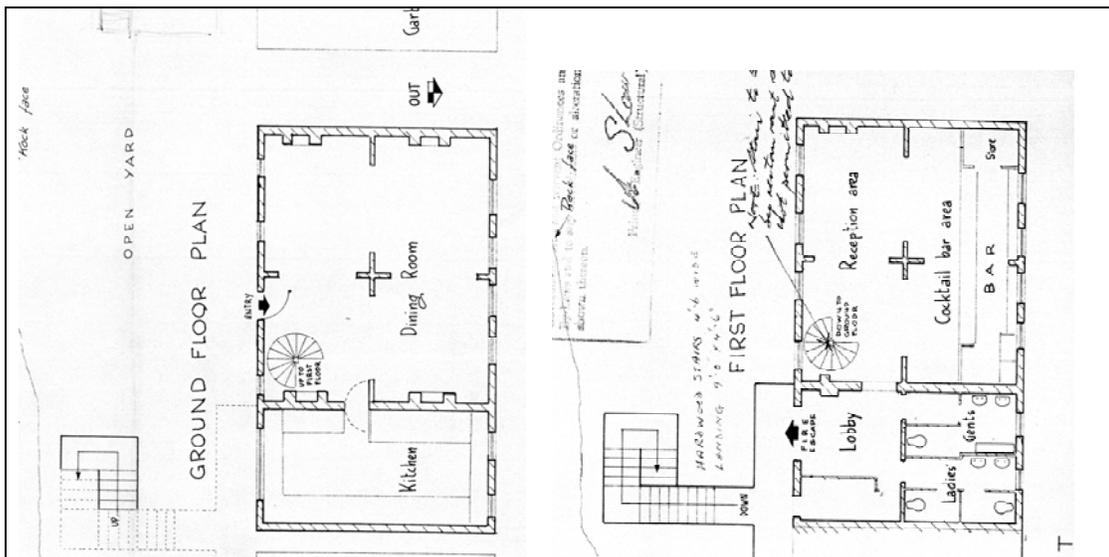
Plans dated June 1974 of the restaurant occupying Nos. 13-17 Playfair Street. (Source: City Archives)
